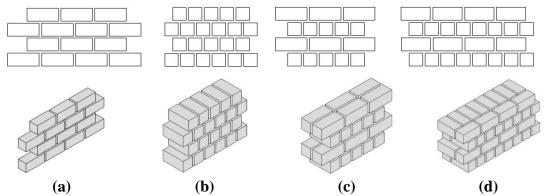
Brick mold walls bond: (a) Stretcher bond; (b) Header bond; (c) One brick walls bond; (d) One and half brick walls bond (photos by Y. Kassou).
